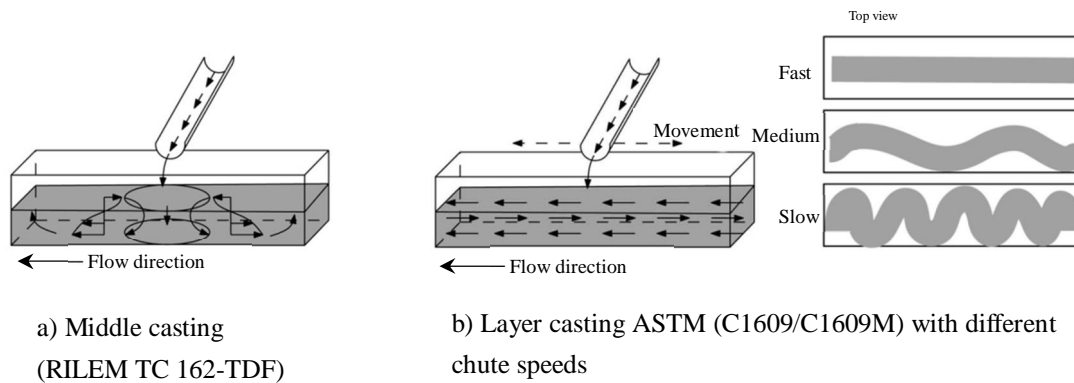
Middle casting method and layer casting method (Wille & Parra-Montesinos, 2012:379).
